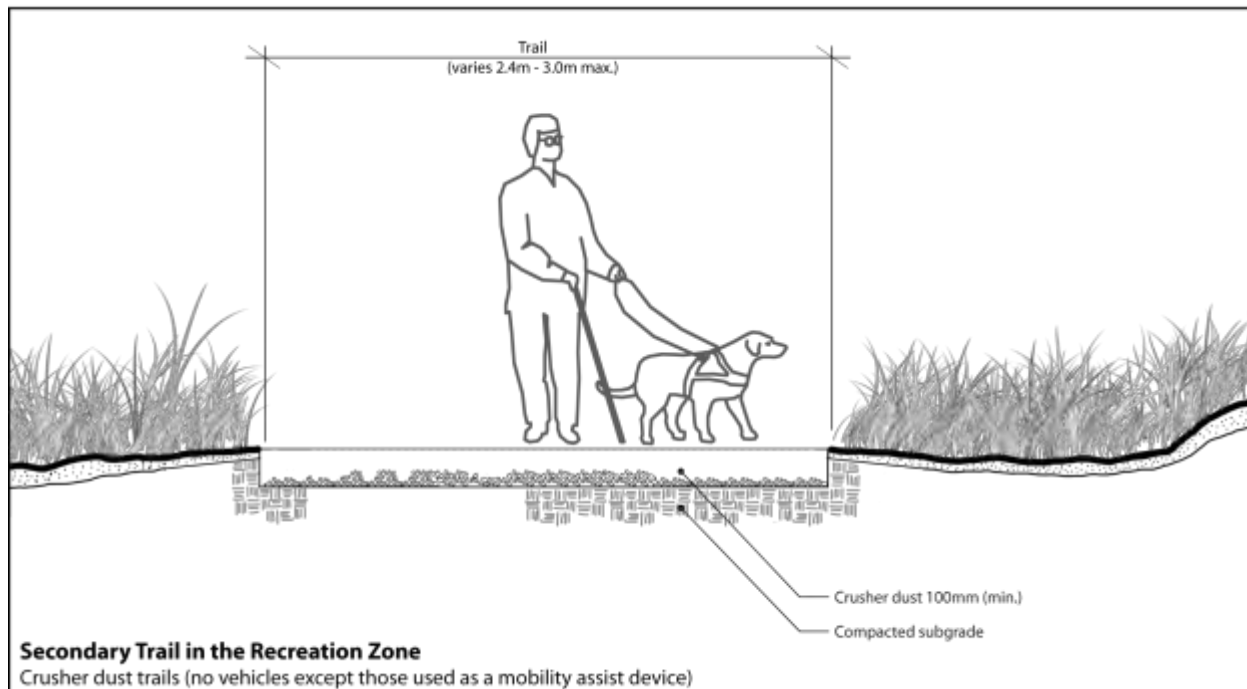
Cross Section of a Secondary Trail in the Recreation Zone
